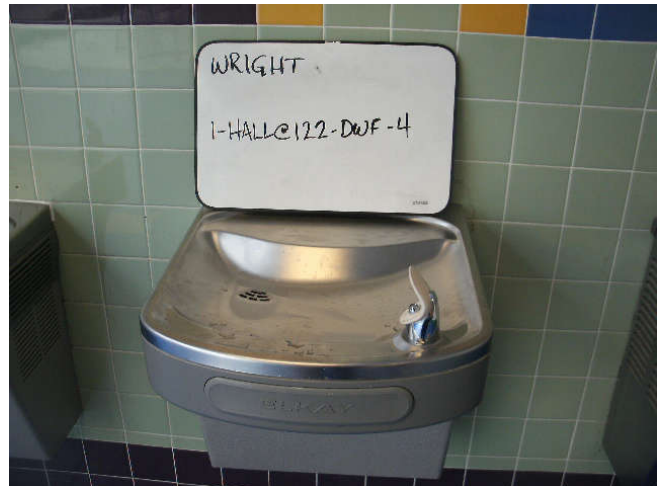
Drinking water fountain, located in a 1st floor hall, across from room 122 – center fixture.
